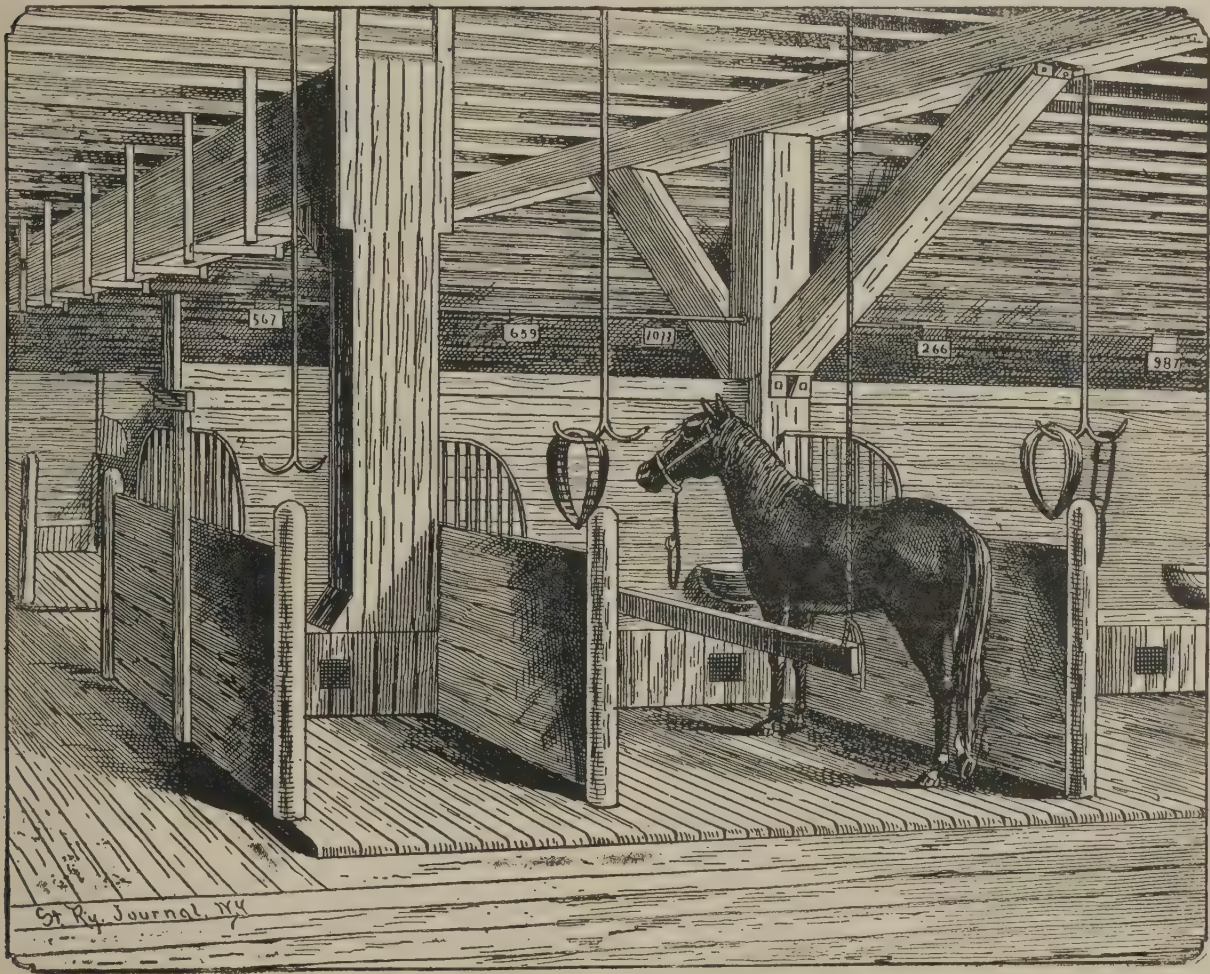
MECHANICAL FLOOR VENTILATION.
